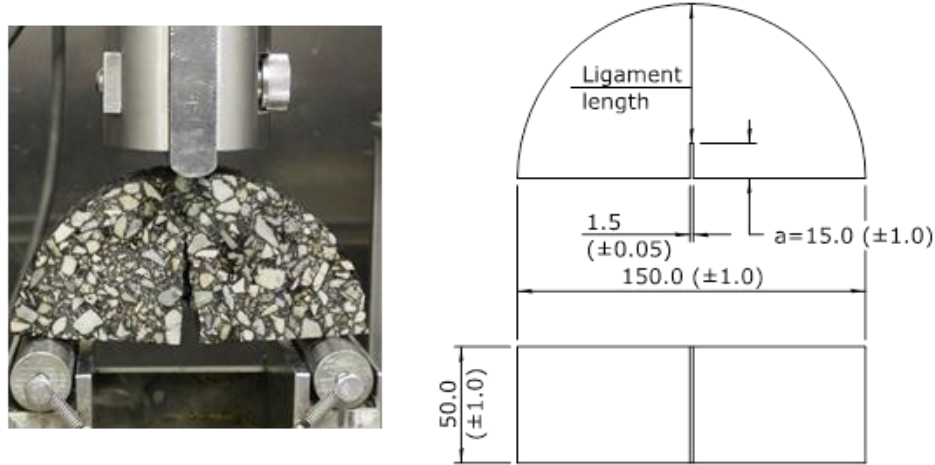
I-FIT test and specimen configuration (dimensions in millimeters).
